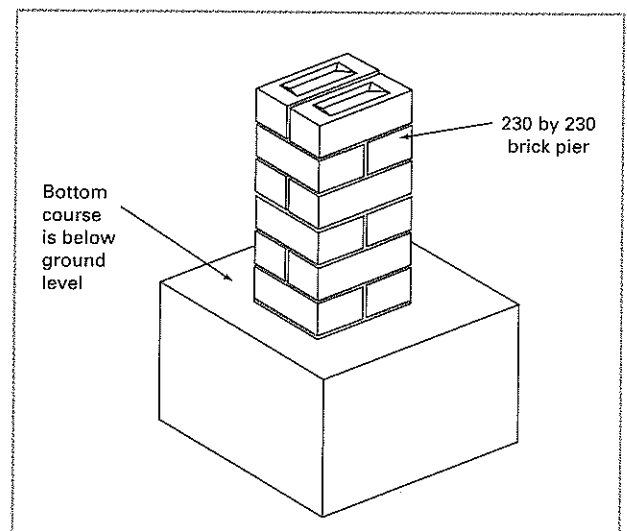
Typical blob footing with a minimum depth of 200 mm
